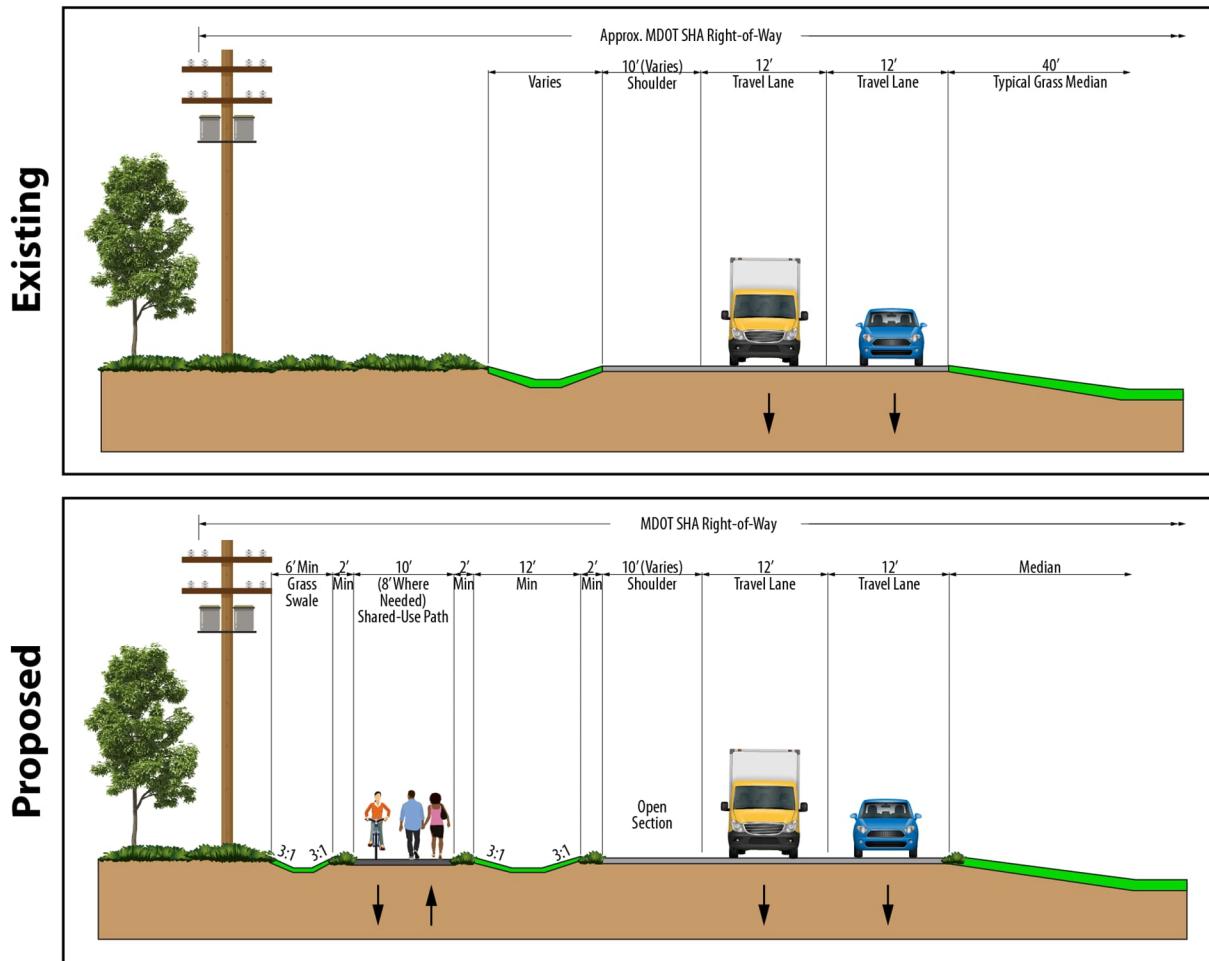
Proposed Westbound US 40 Open Section, Looking East
